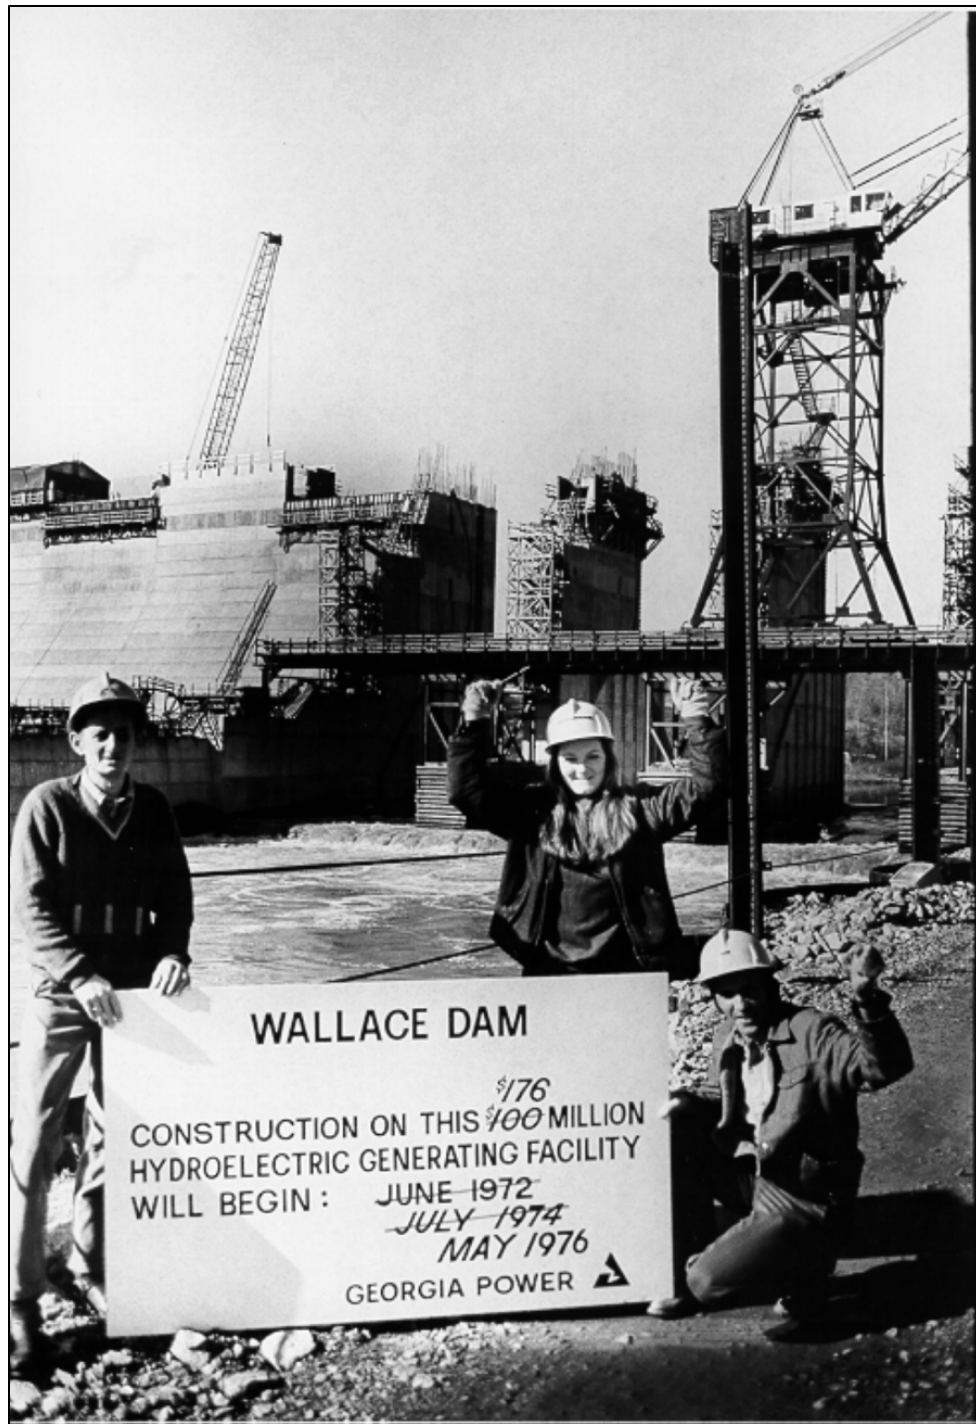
View of the Powerhouse and Intake Spiral Case Structures Under Construction at Wallace Dam, July 1978, View West (Source: Wallace Dam Photograph Archives)
